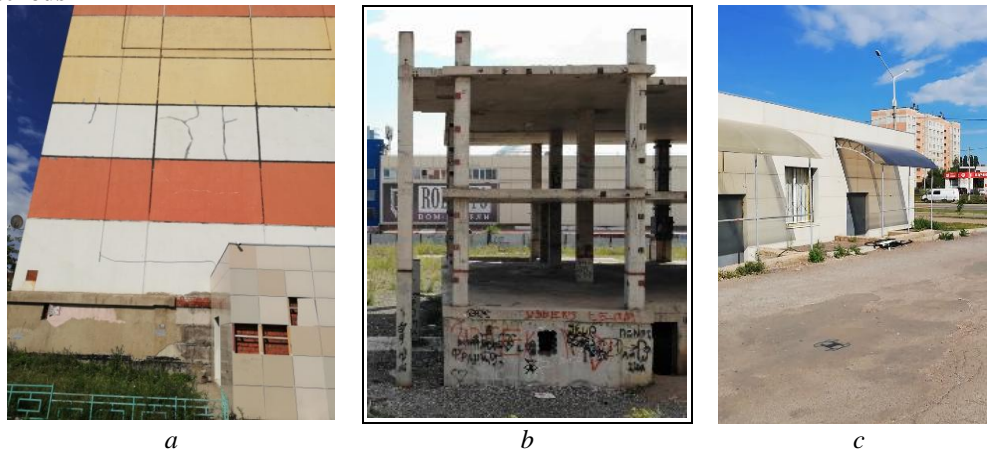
Type of objects of inspection: a – view of a residential building from destruction on the outer wall; b – type of object of unfinished construction; c – type of roadway
